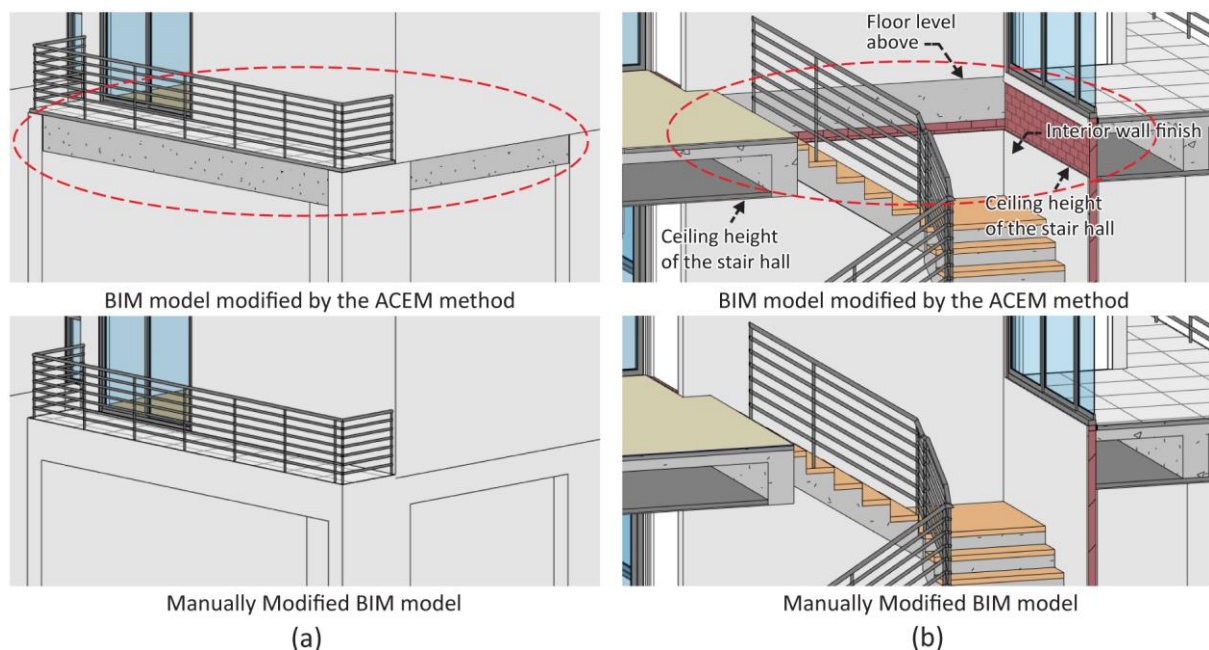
(a) The ACEM prototype system did not create walls that are exterior wall finish on the surfaces of beams that do not attach to walls. (b) The height of the walls that are interior wall finish at the stairway was equal to the ceiling height of the stair hall, while in actual construction, the height of the walls must reach the floor level above.
